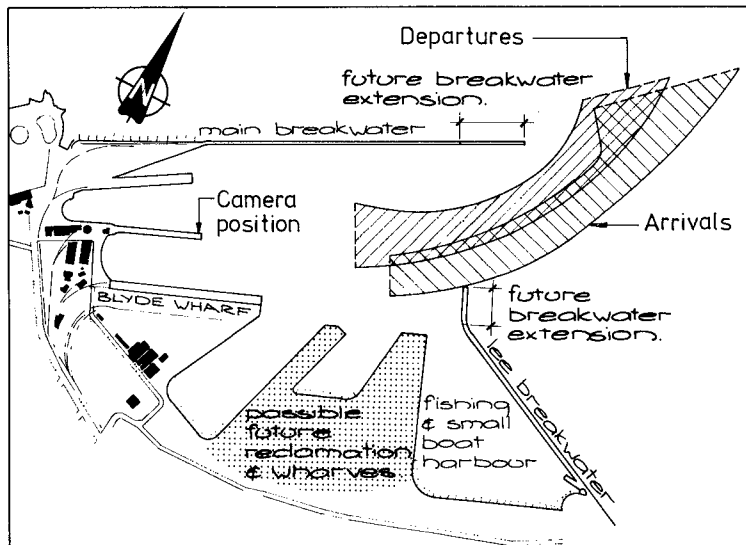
PLAN - ENVELOPE OF SHIPS TRACKS
